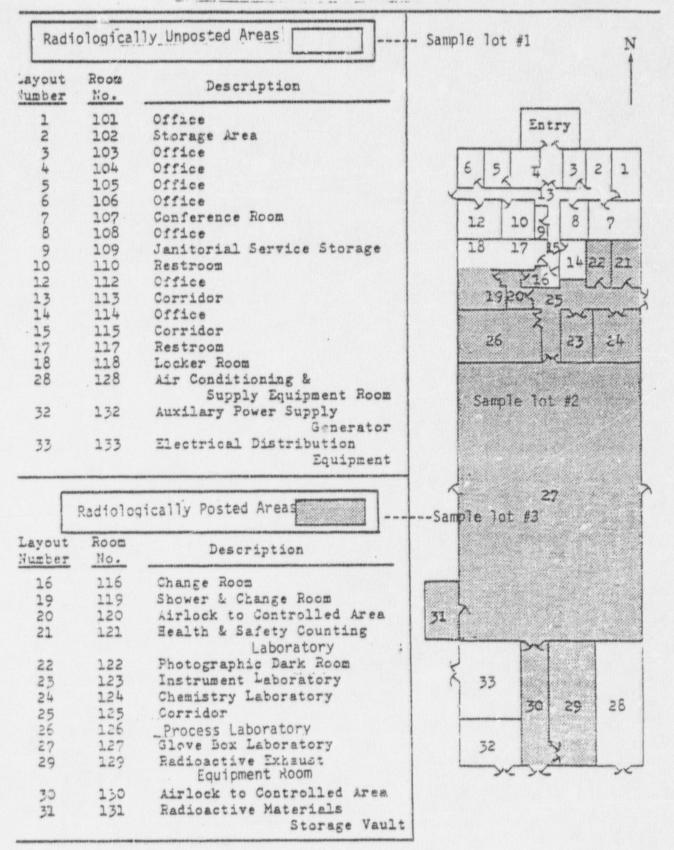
THE NNDF ARCHITECTURAL PLAN
